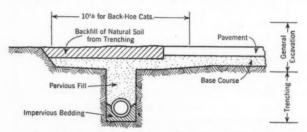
Base-Course Drainage Detail to Permit Machine Excavation
